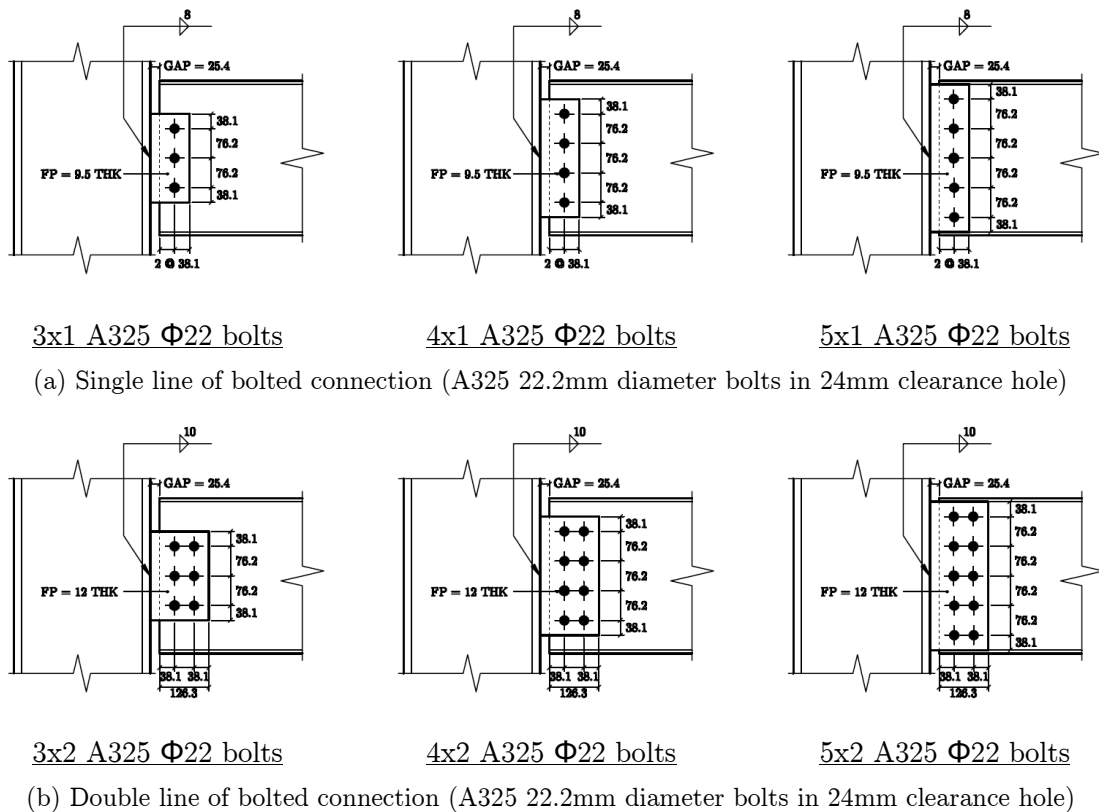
Various fin plate connections considered in the study of NIST floor system
